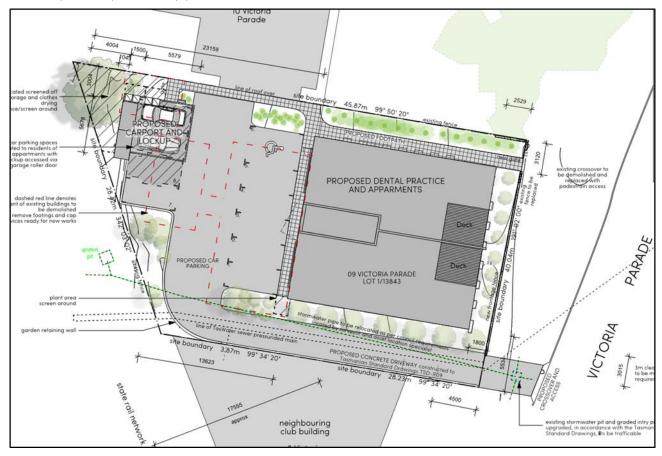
Site Plan of proposed development (\$ Group, April 2018)
